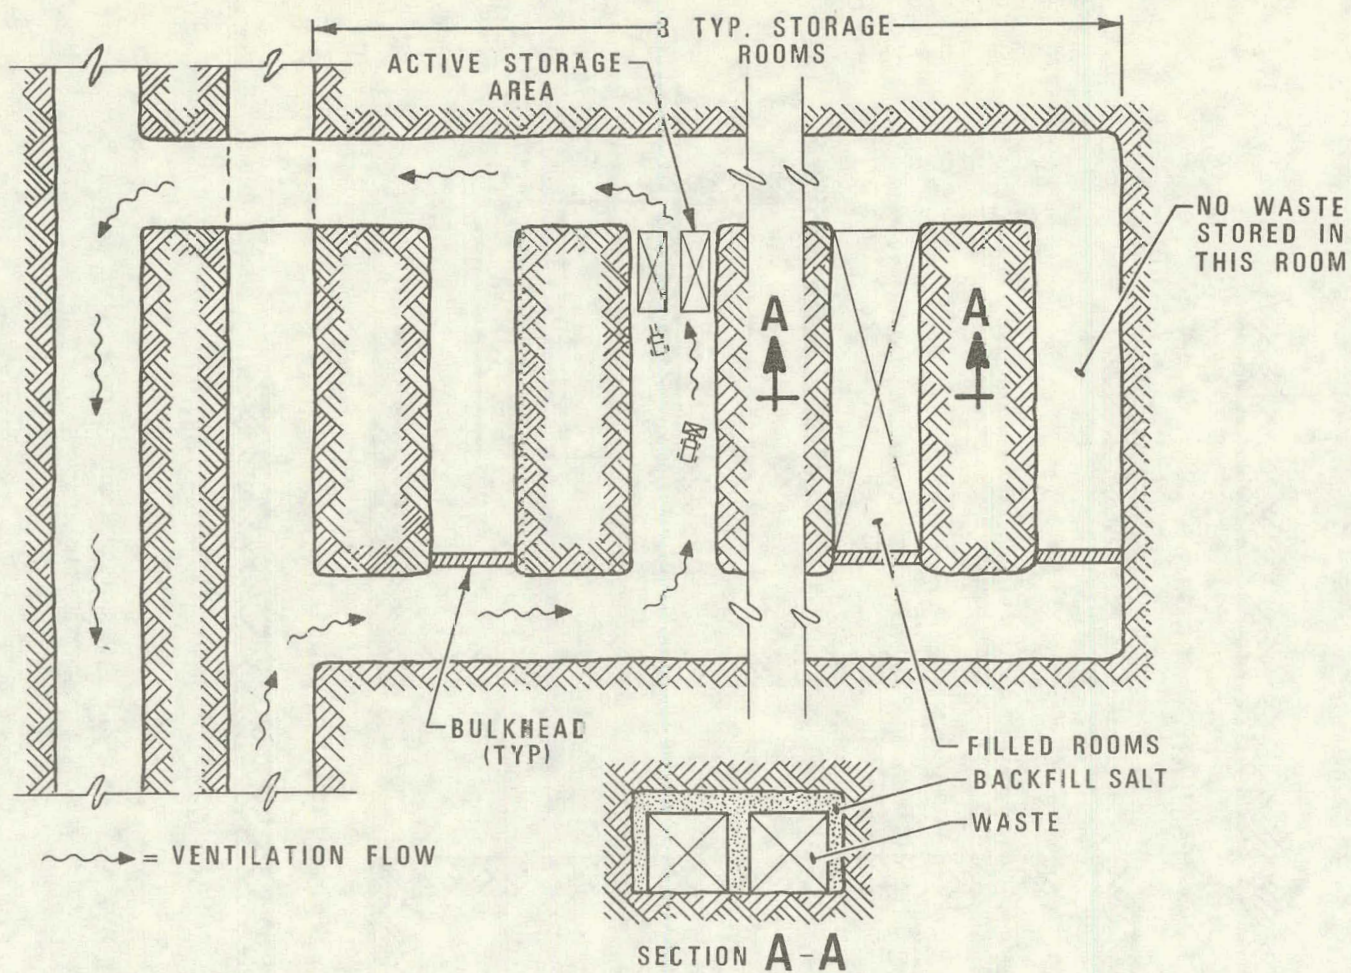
Experimental TRU waste storage configuration
